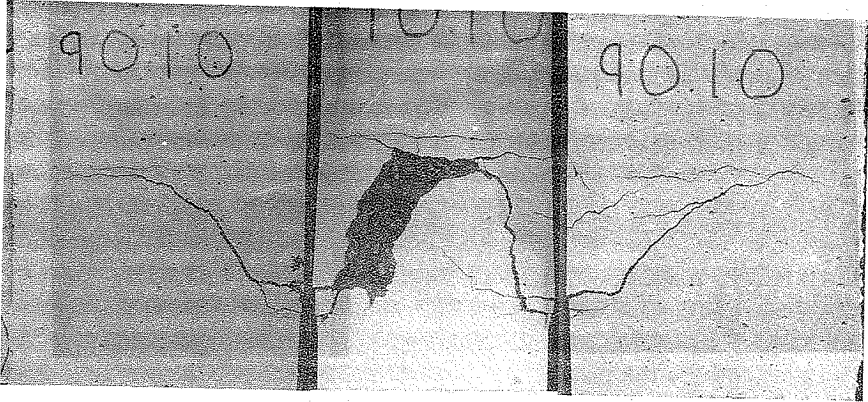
Failure of S.B.-specimen No. 90/10.
